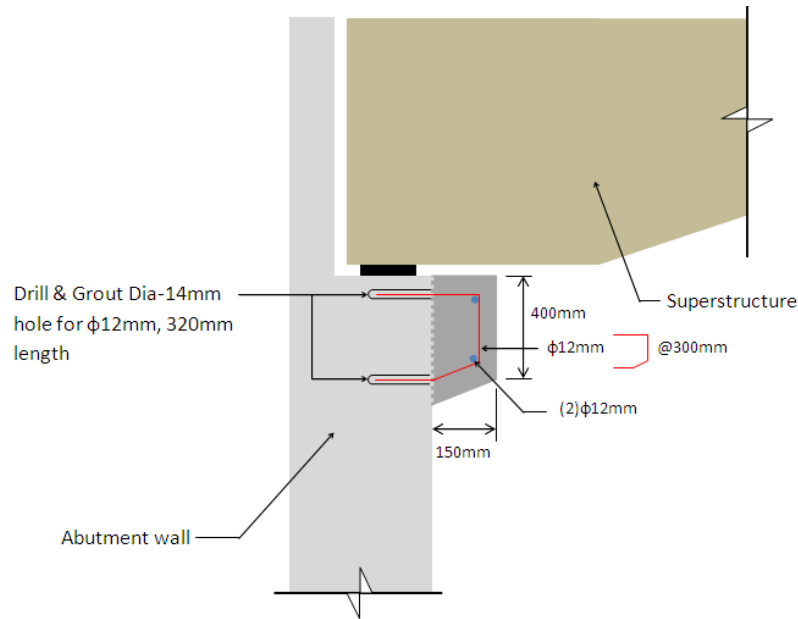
Seat extension of Abutment #1 in Alharamain Bridge
